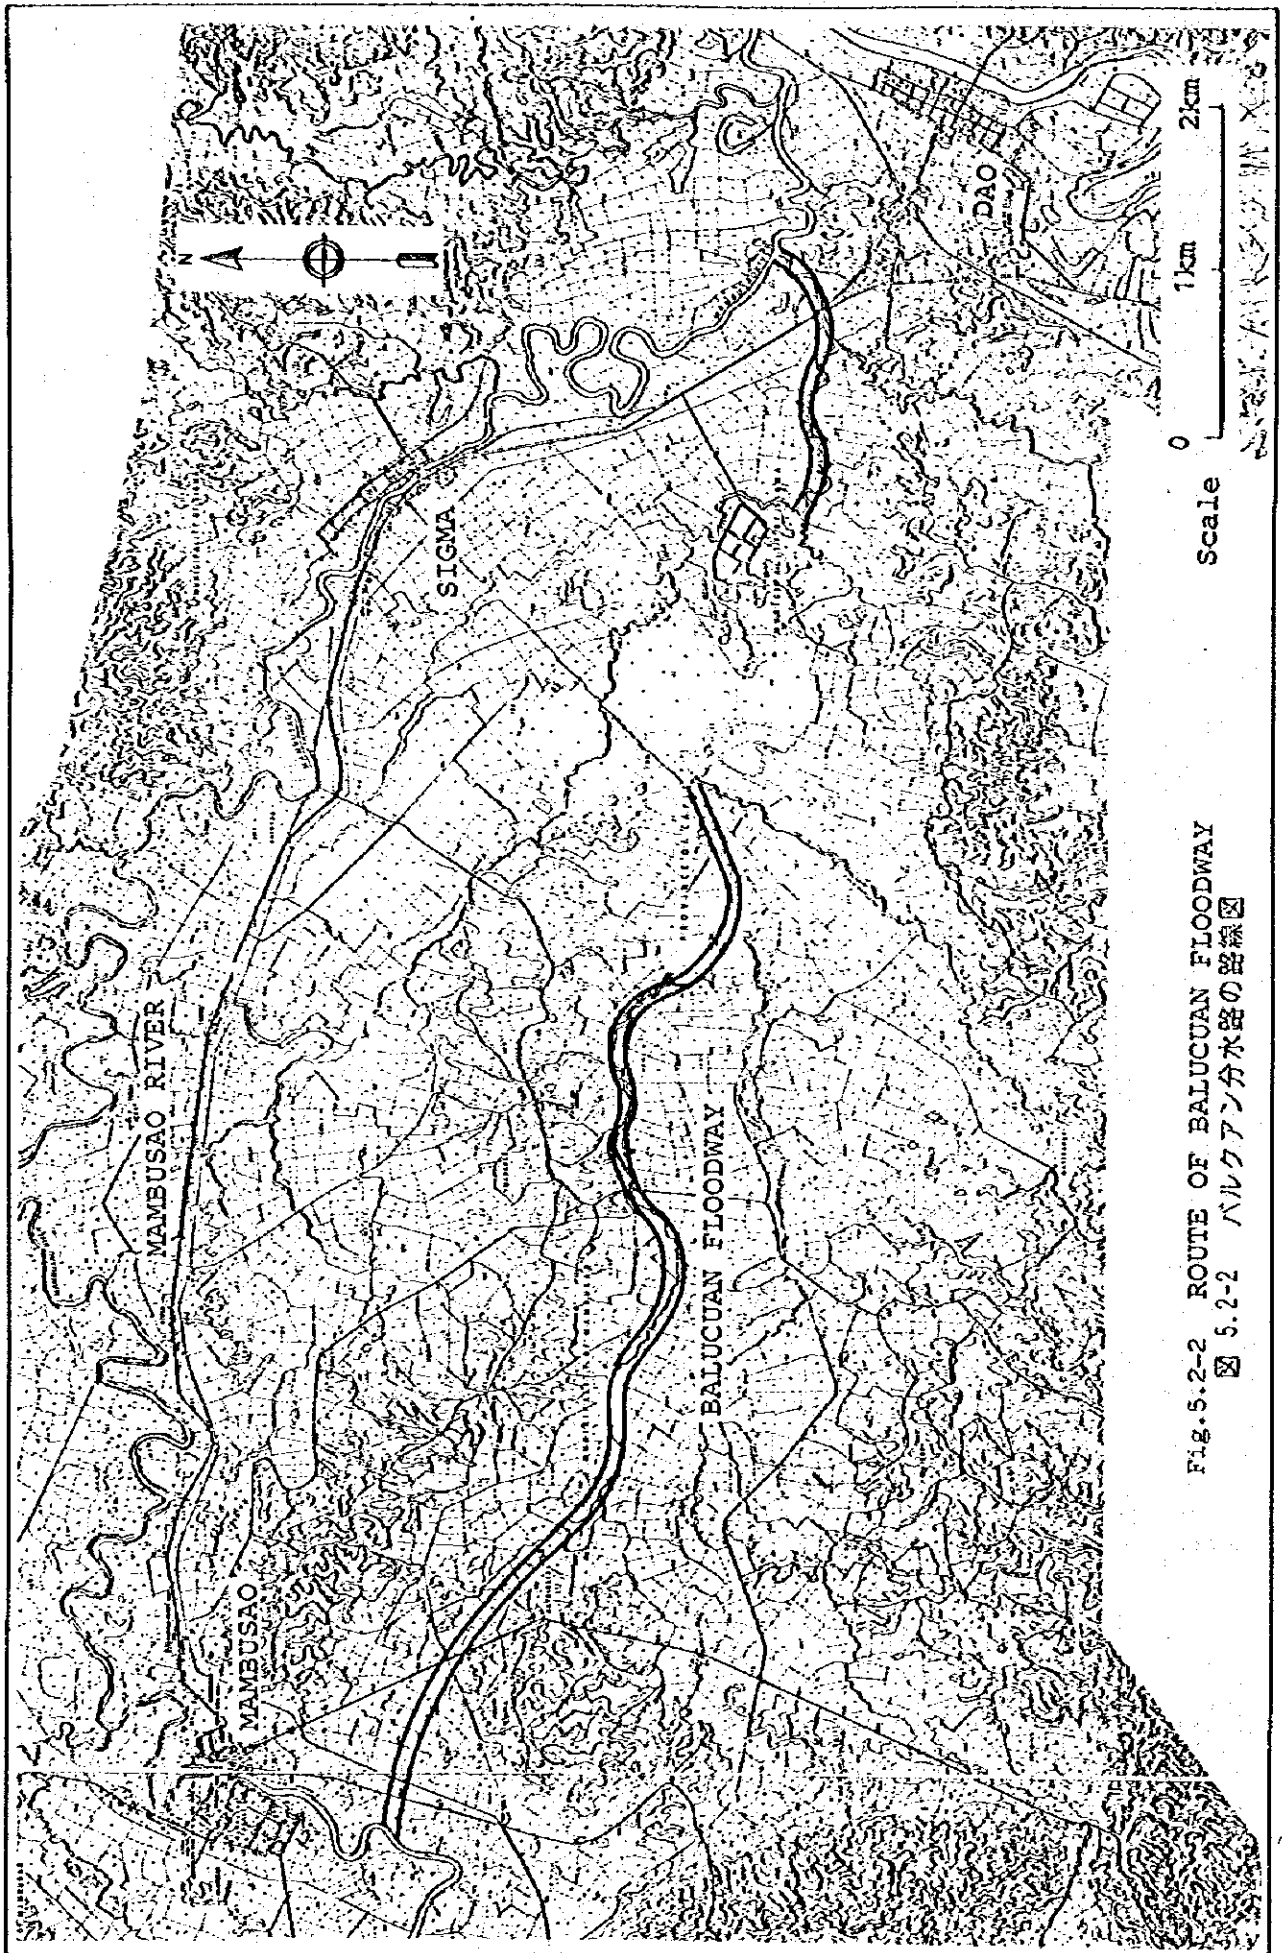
ROUTE OF BALUCUAN FLOODWAY
